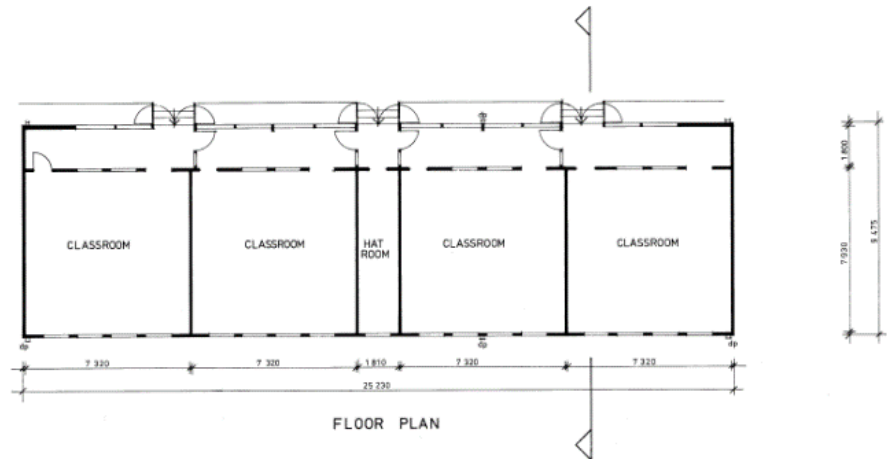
The Haven, Floor Plan. (Source: Robertson & Hindmarsh Architects, 1994)
